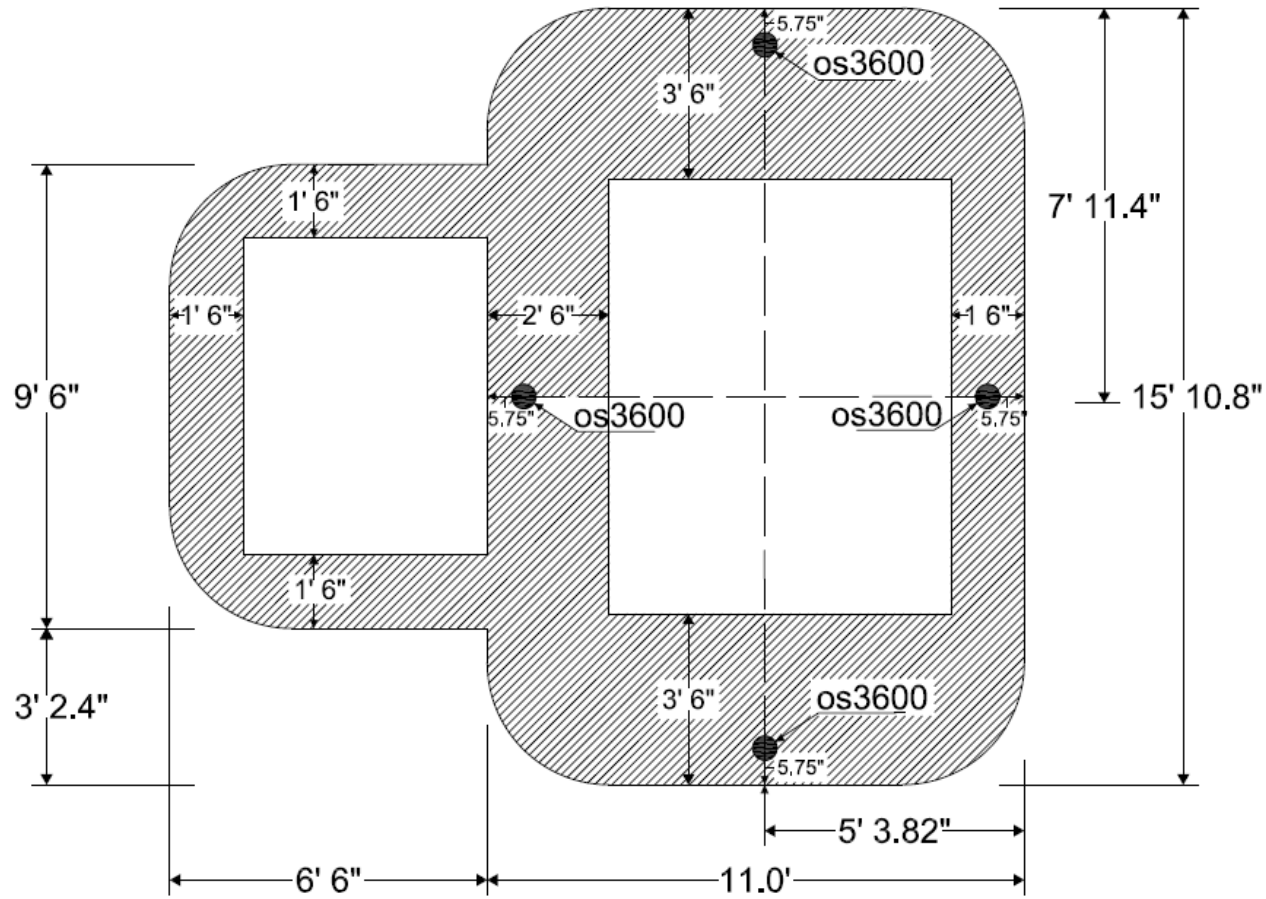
Cross-section of pylon 5 East showing location of strain sensors at lift B1 (elevation 18')
